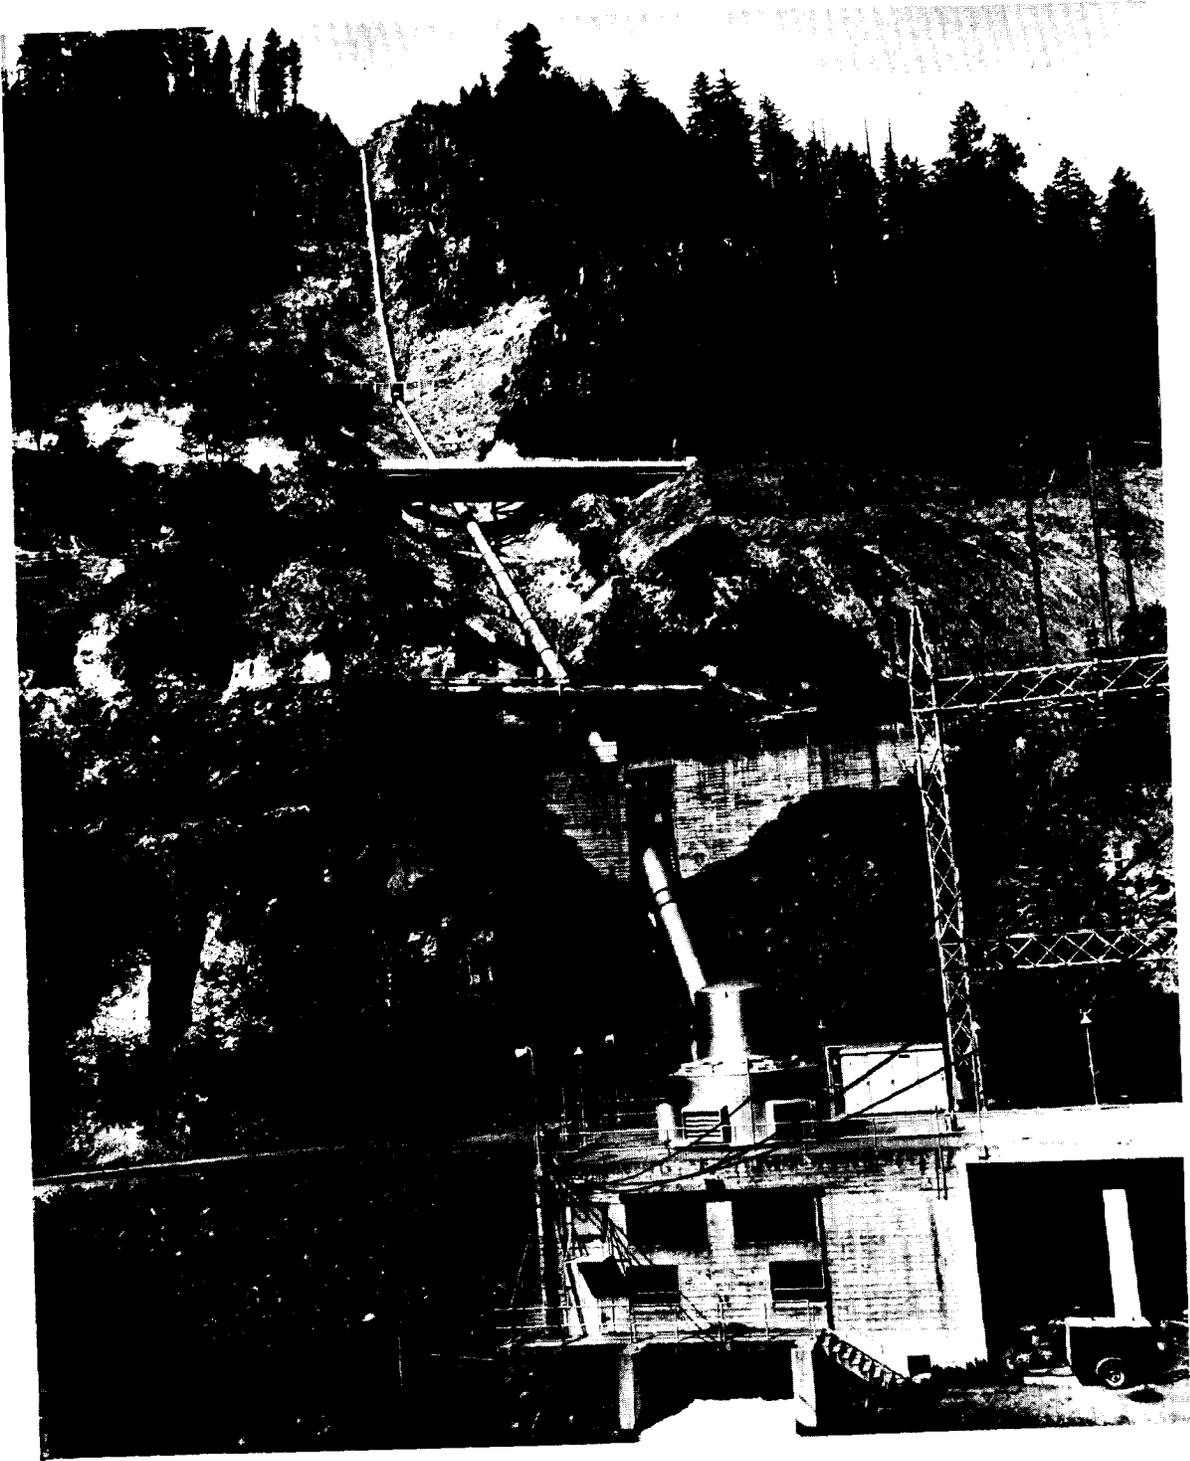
Penstock and outdoor powerhouse, Fish Creek Project (Courtesy of Pacific Power and Light Company)
